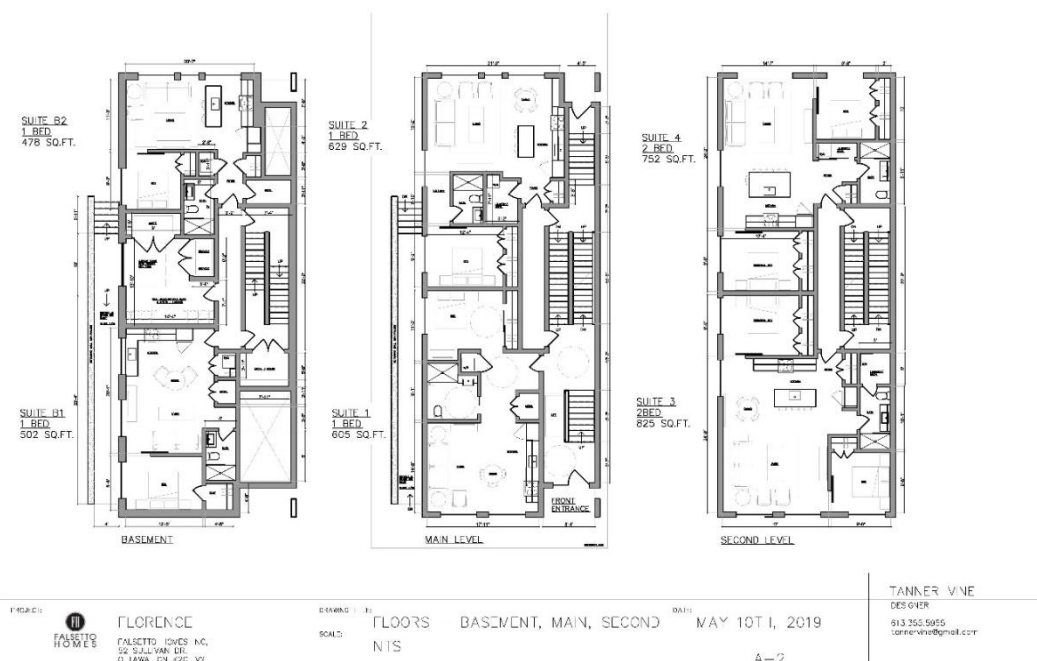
Proposed floor layouts for the apartment building. Source: Tanner Vine, 2019
